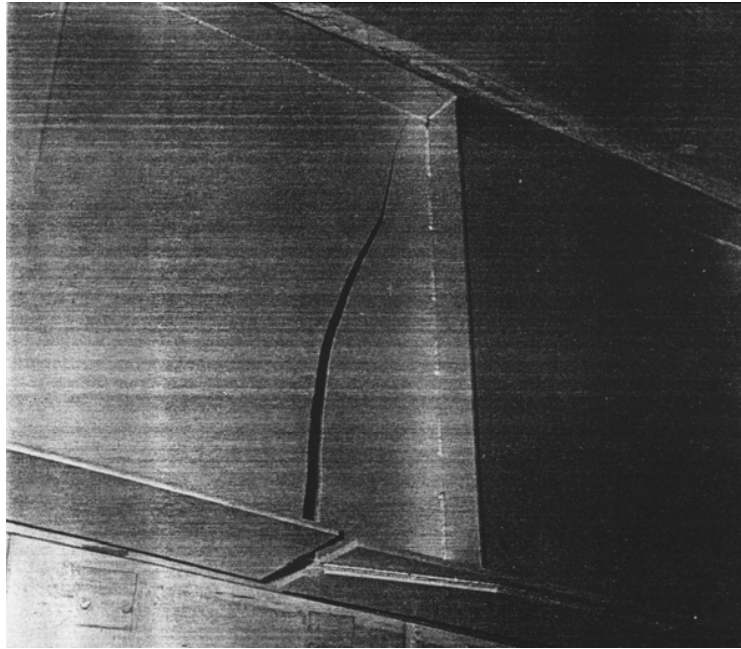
Brittle Crack in King's St. Bridge Girder, Melbourne
